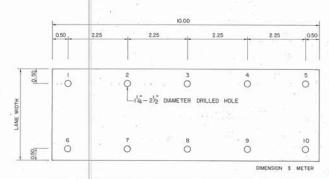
PLAN OF DRILLING FOR CEMENT MORTAR COMPRESSION ALONG THE PUMPING JOINT
